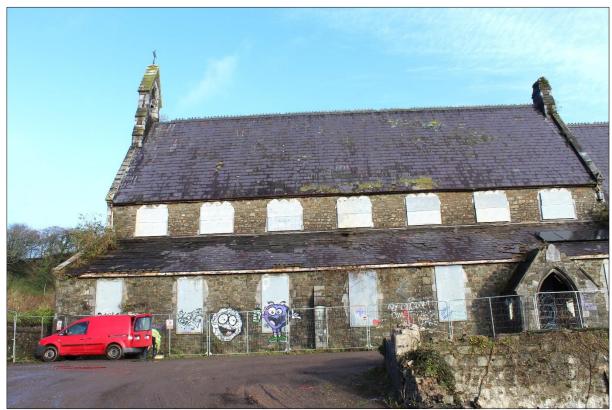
Southern elevation with large area of missing slates to western side of aisle roof
